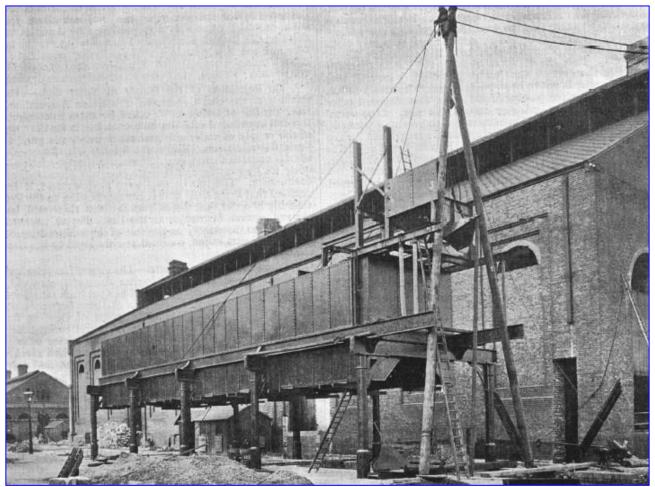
Archive photograph showing the coke hoppers and railway dock under construction, 1902, after The Journal of Gas Lighting and Water Supply 1902, 932 (NGA Ref: G7\_1902\_V80\_P932)
